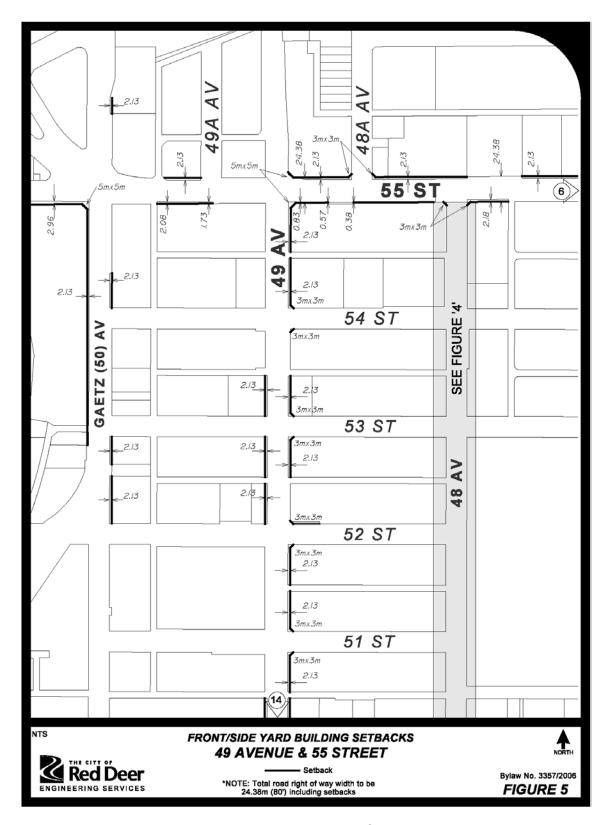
Front/Side Yard Building Setbacks 49th Avenue & 55 Street
